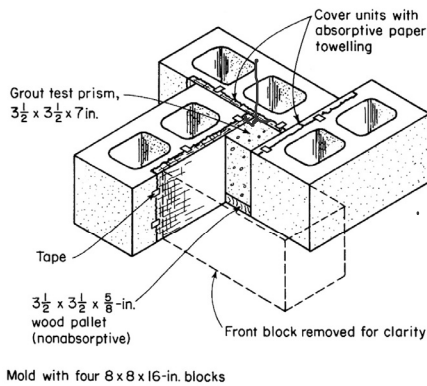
ASTM C1019 method of using masonry units to form a prism for compression-testing of masonry grout.
